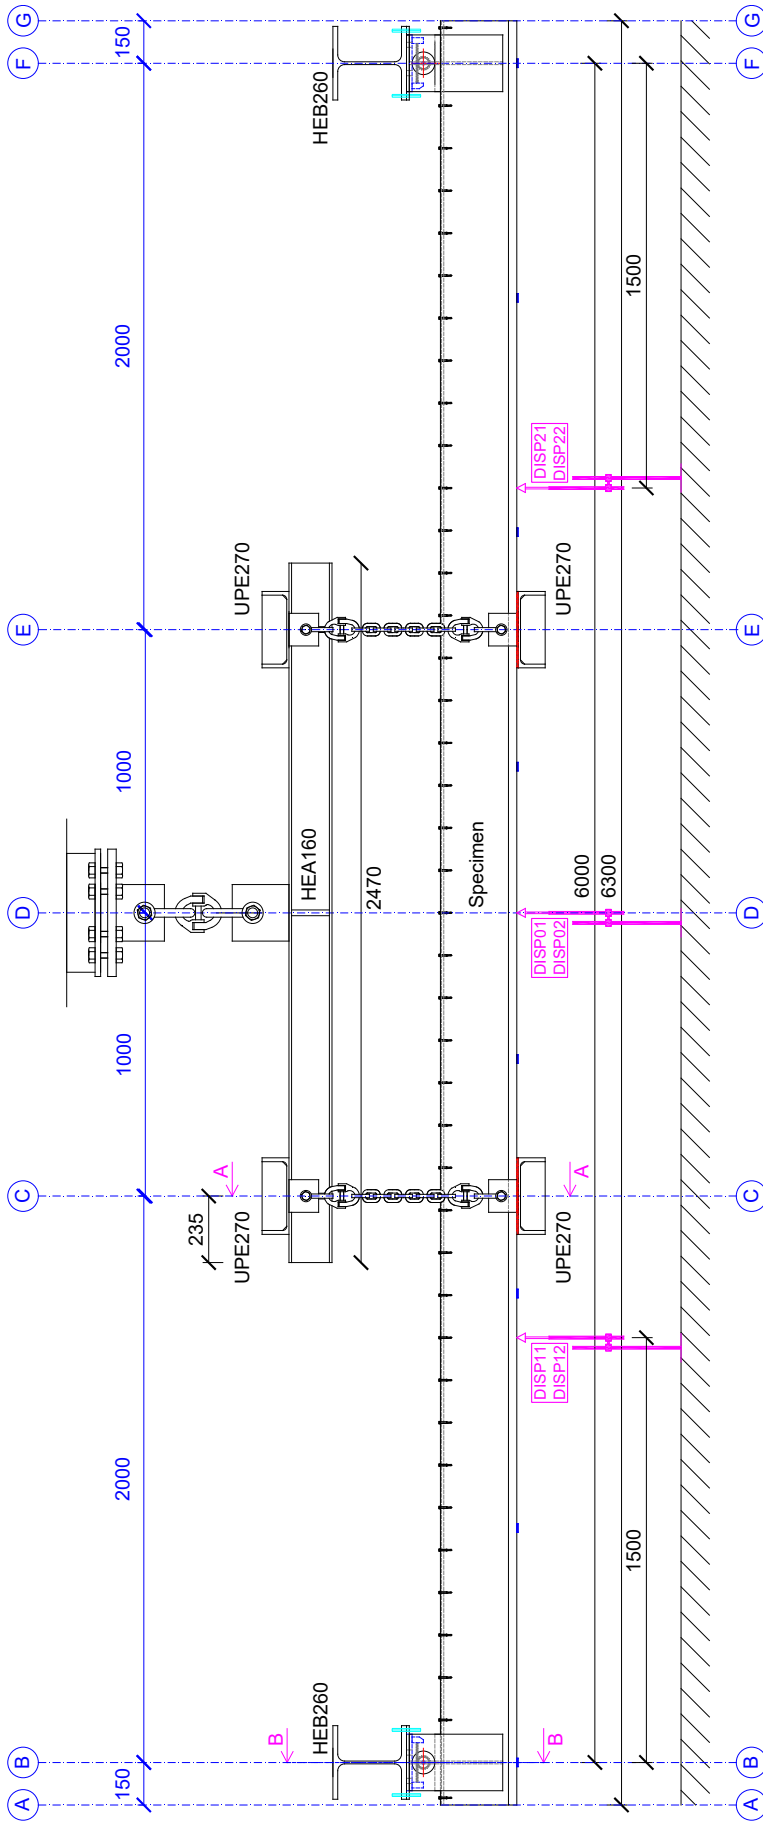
Layout of the steel beam specimen placed in test frame - (main view)
